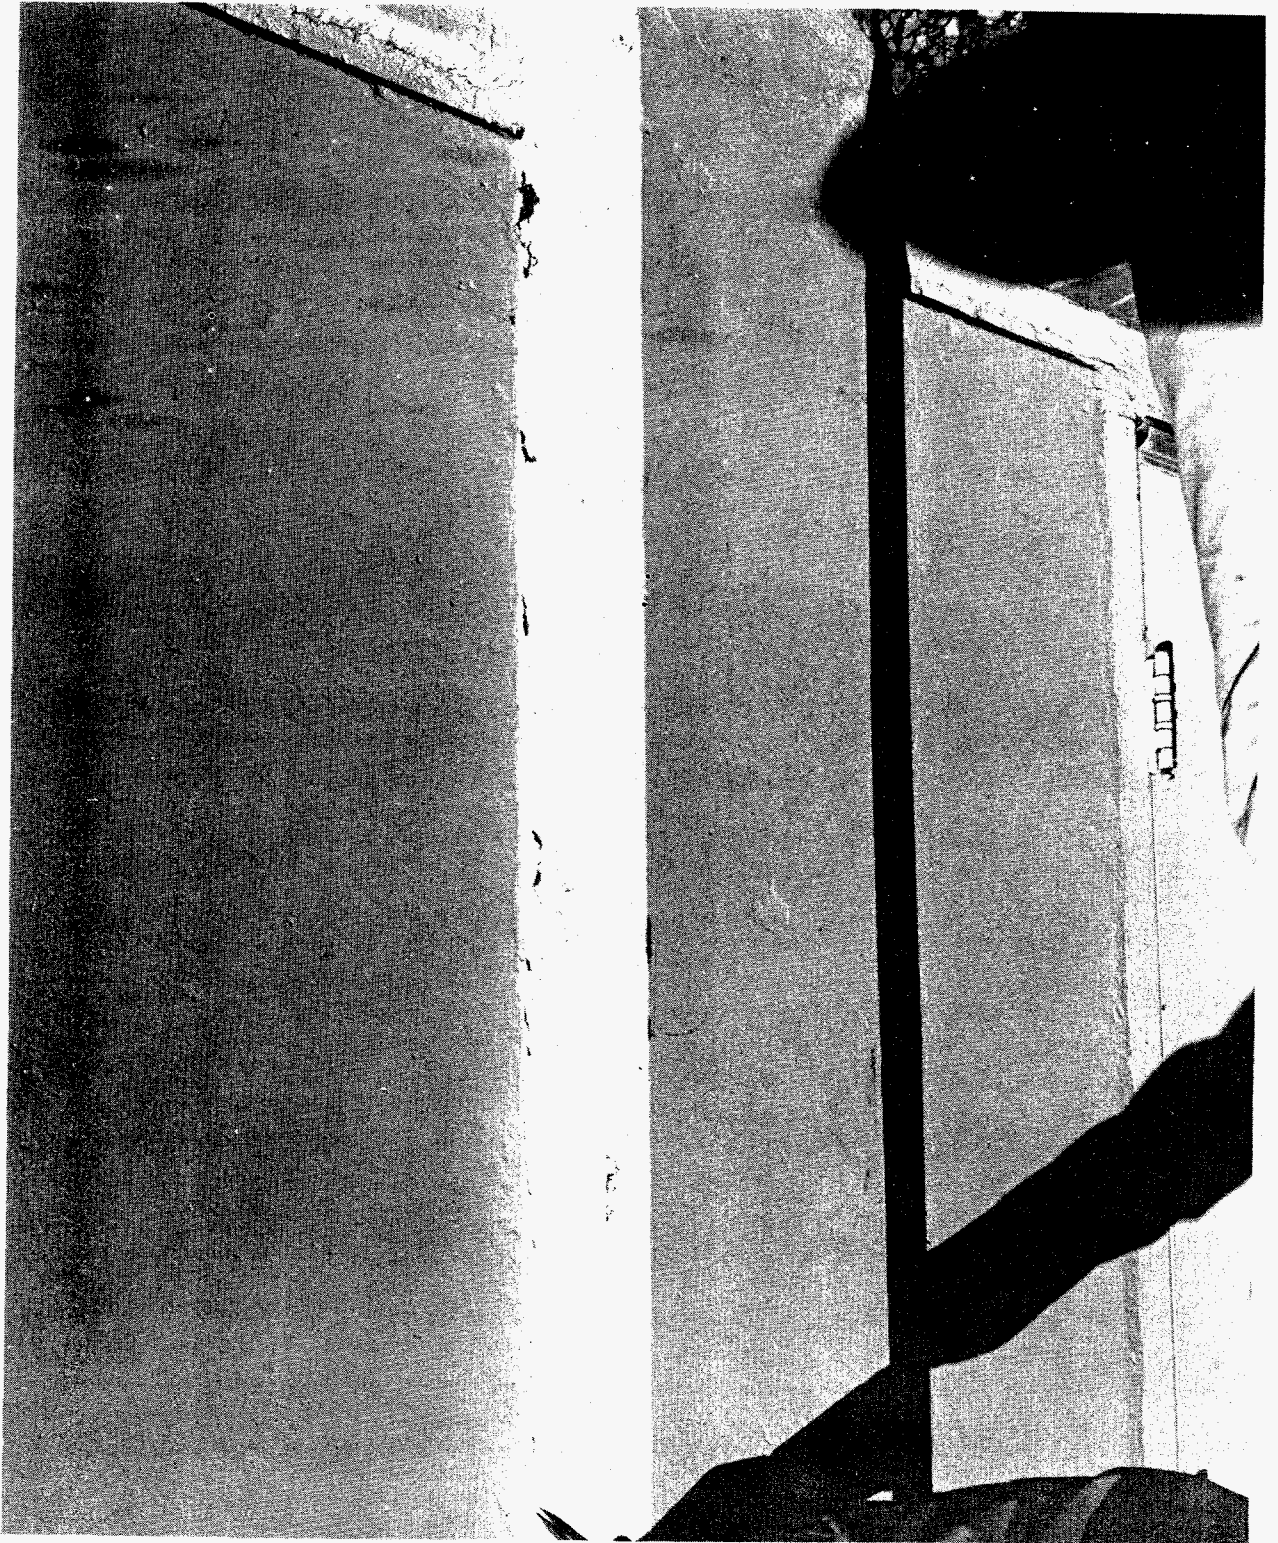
Building 725, south side, additional spalling at panel-post junction, intermediate inspection.
